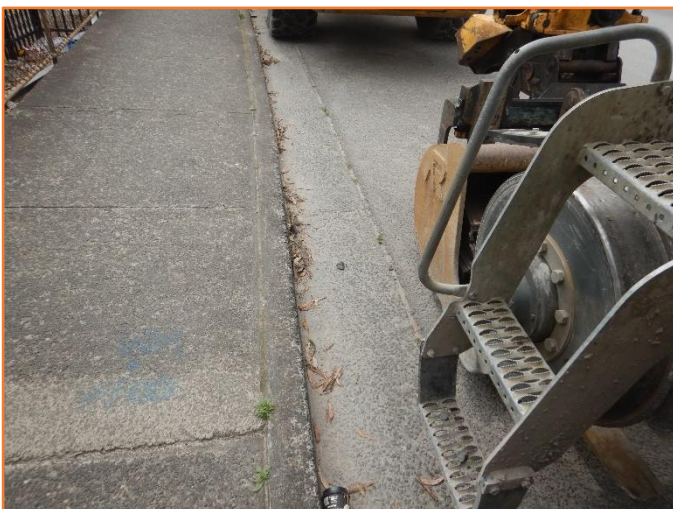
Reasonable - General condition of kerb and gutter. Minor cracking observed.
